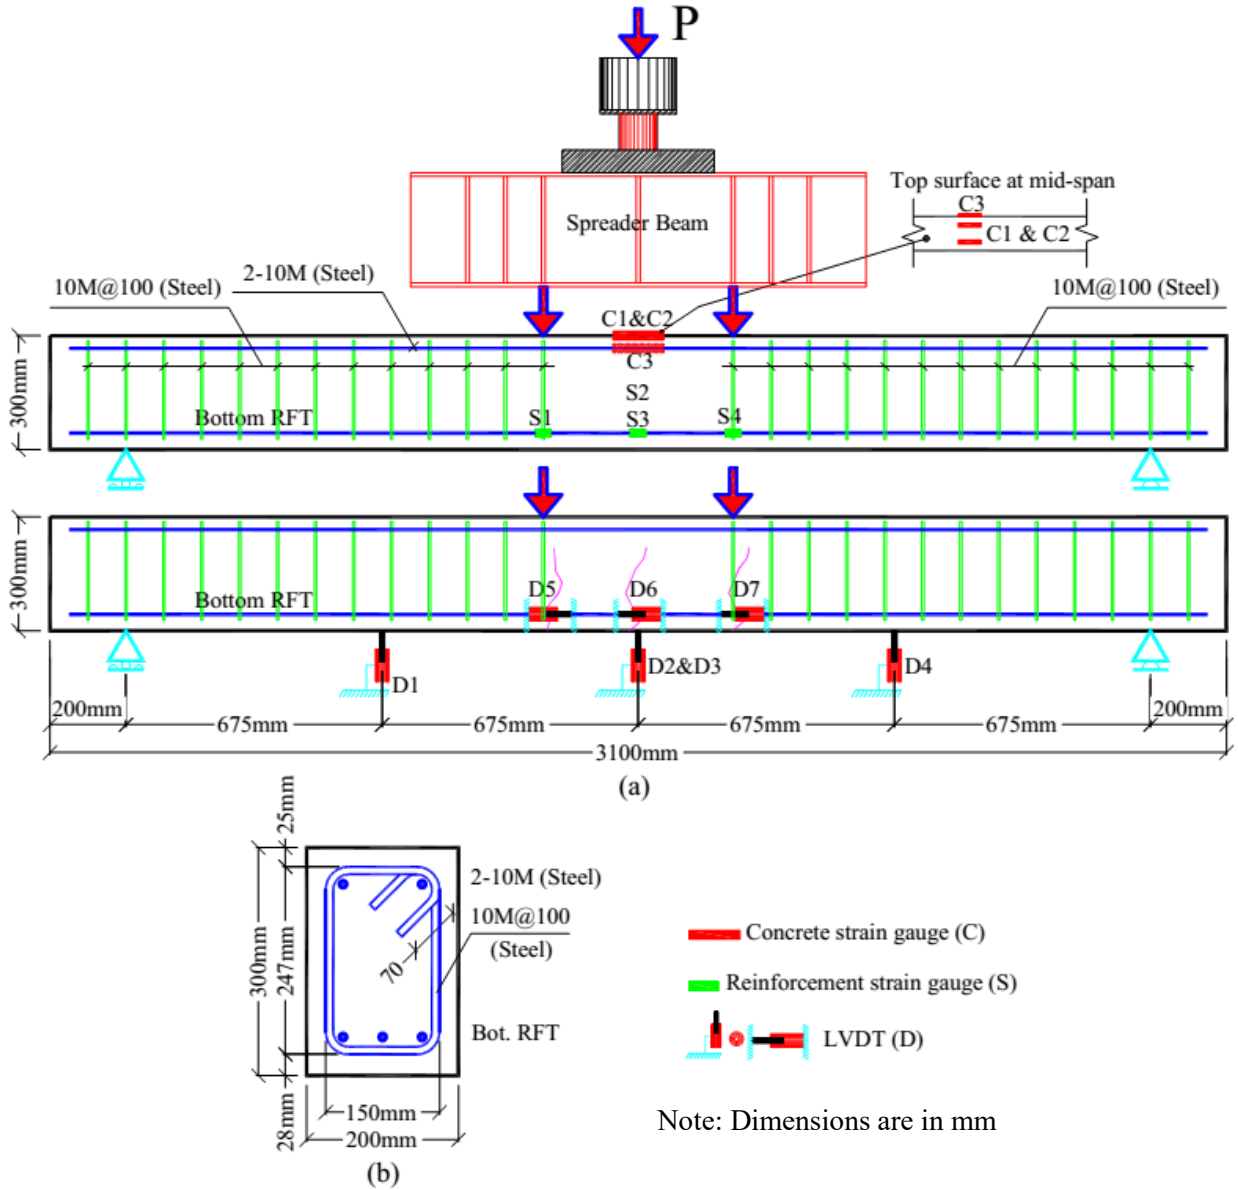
Schematic drawing for concrete dimensions, reinforcement details, typical location of instrumentation and test setup: (a) Elevation; (b) Cross- sections
